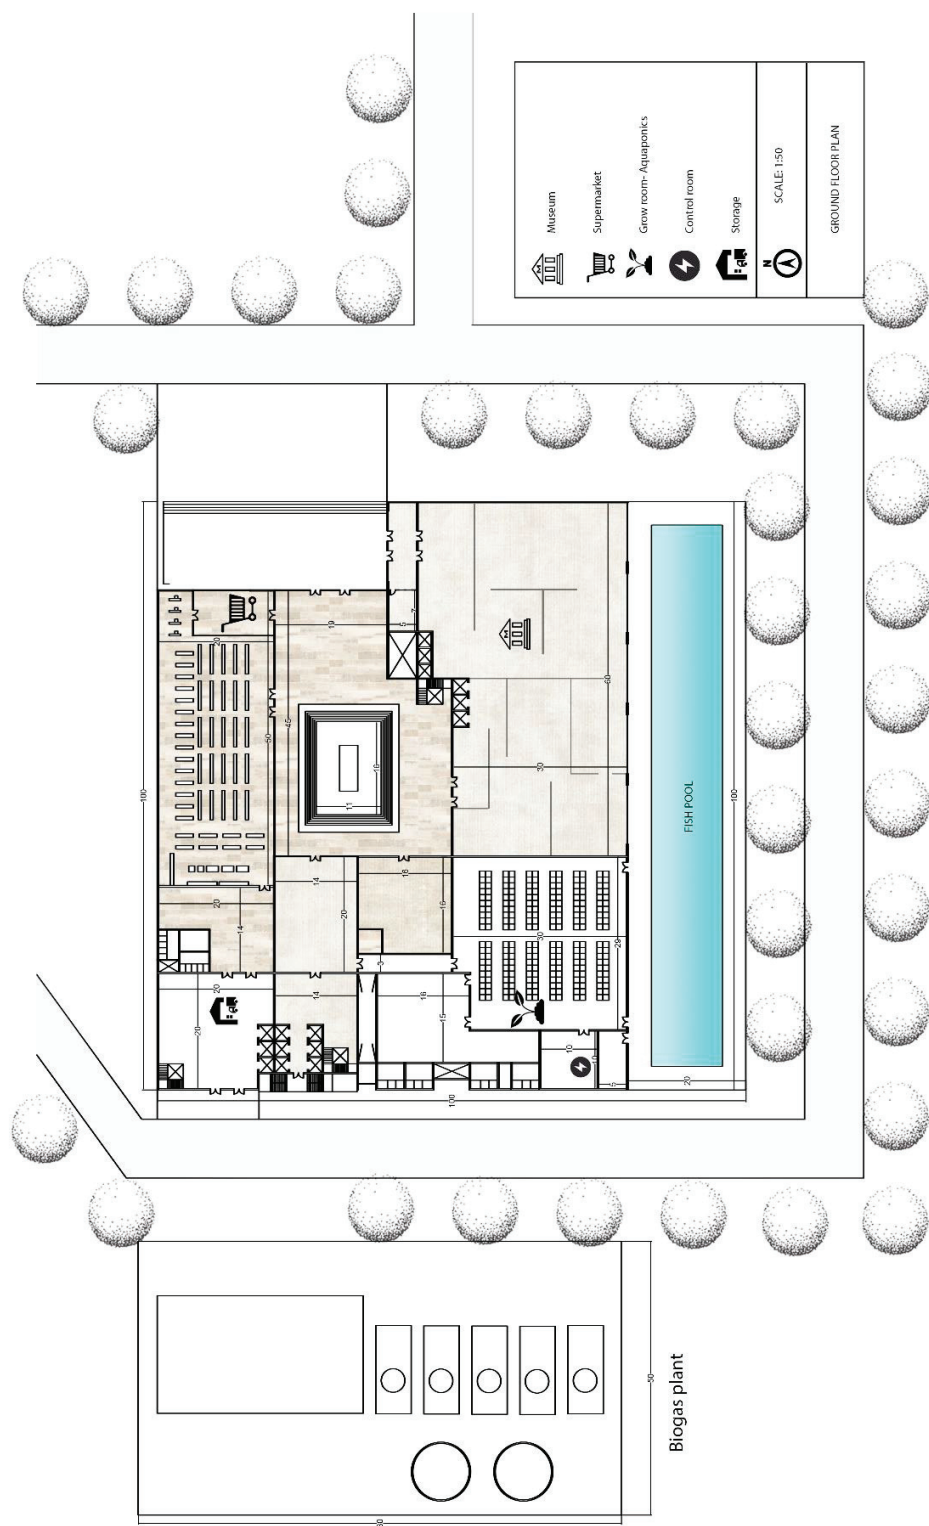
Ground Floor Plan (Illustrated in Adobe Photoshop)
